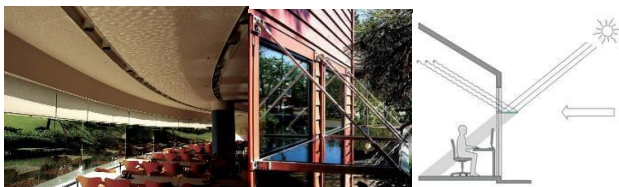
shows light reflections in the interior space and shows arch. Façade and shows detailed section Image source: [10]
